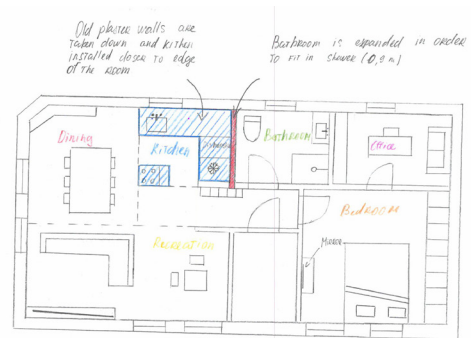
Sketch layout of the attic, with a bigger kitchen
